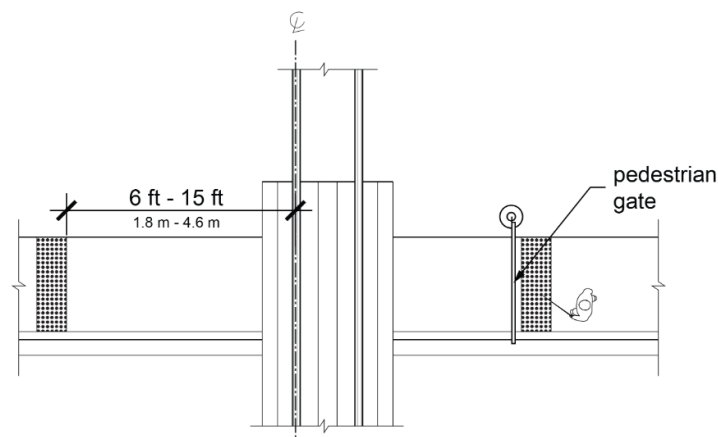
Pedestrian At-Grade Rail Crossings Not Located Within a Street.
